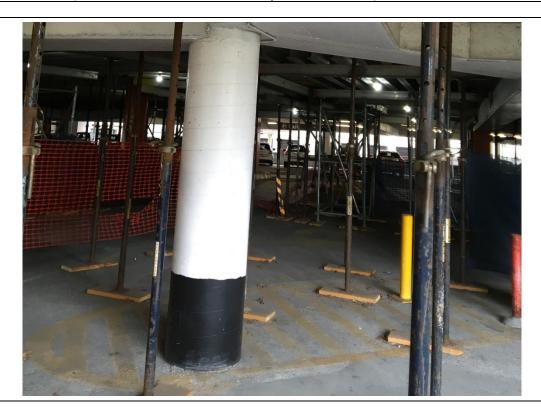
Lead-Based White/Black Paint on Round Concrete Vertical Columns
